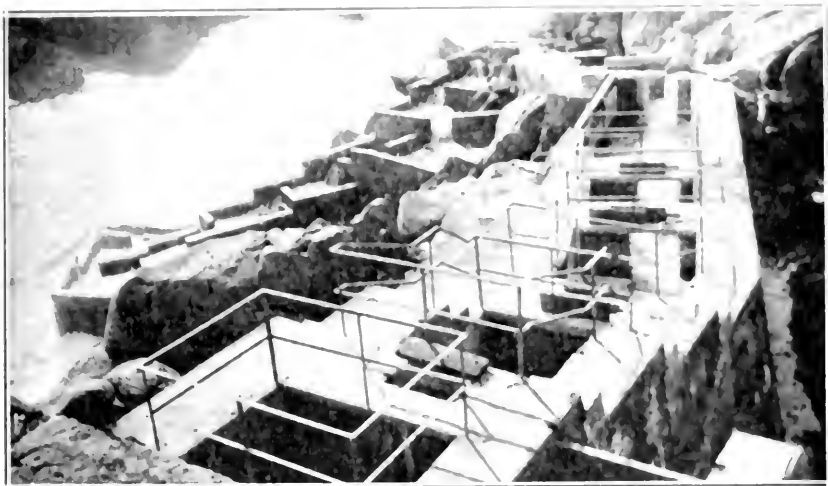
Fishway over Fishers Dam, American River, California. Elevation, 15 feet. Lowest four pools adjustable to 10 feet. Pools adjustable ports at upper end.
